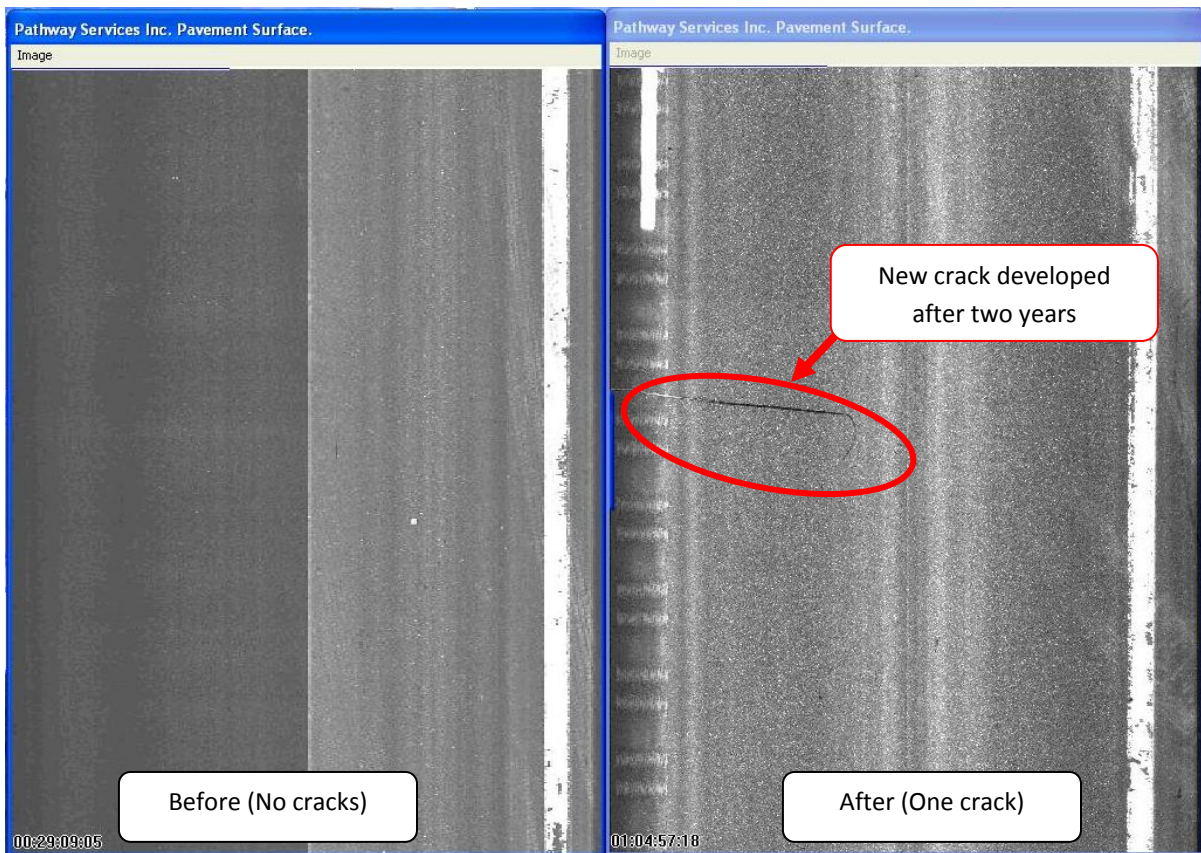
Example Pavement Imagery from Before and After Rumble Strip Installation
